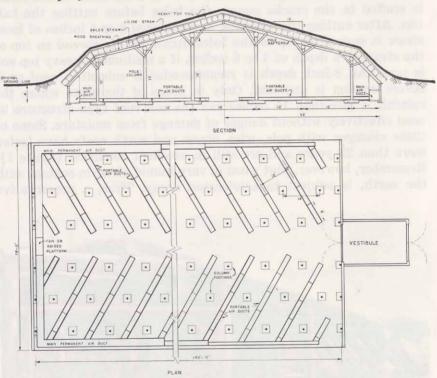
Floor plan and cross section drawings of a PARTIALLY BELOW GROUND, SUPPORTED ROOF TYPE POTATO STORAGE CELLAR. These drawings show the air ducts in place as if the storage were full. The center ducts are portable and should be placed on the floor as the storage is filled. If the storage is partially filled, the ventilating system can be made effective by blocking all main air duct outlets not in use. For proper operation the free end of all portable air ducts must be plugged. Complete working drawings for this cellar may be obtained by ordering PLAN No. .734-22, Supported Roof Type Potato Cellar, from the Agricultural Engineering Department, University of Idaho, Moscow.
